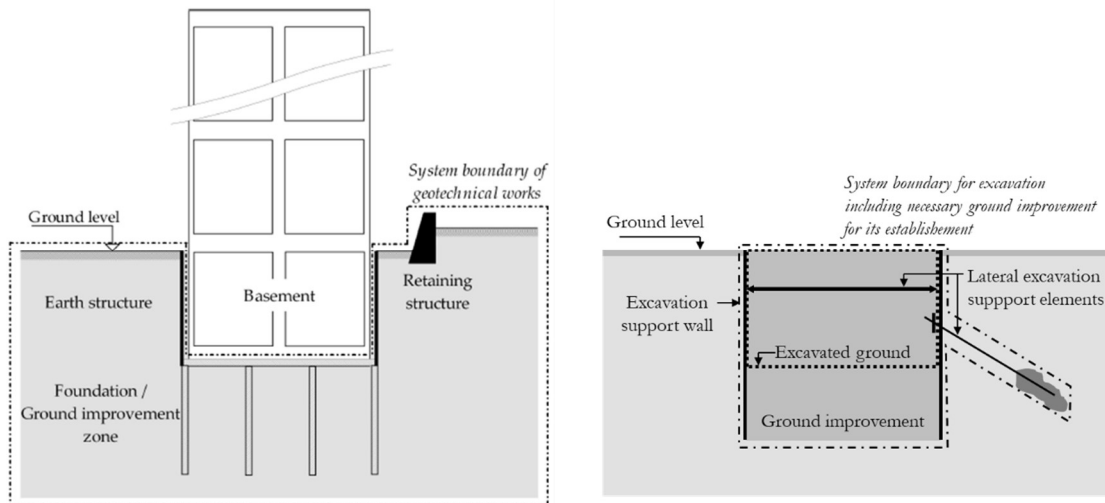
System boundary for geotechnical works connected to building construction as suggested by Song et al. (2021) (left) and in the current study (right).
